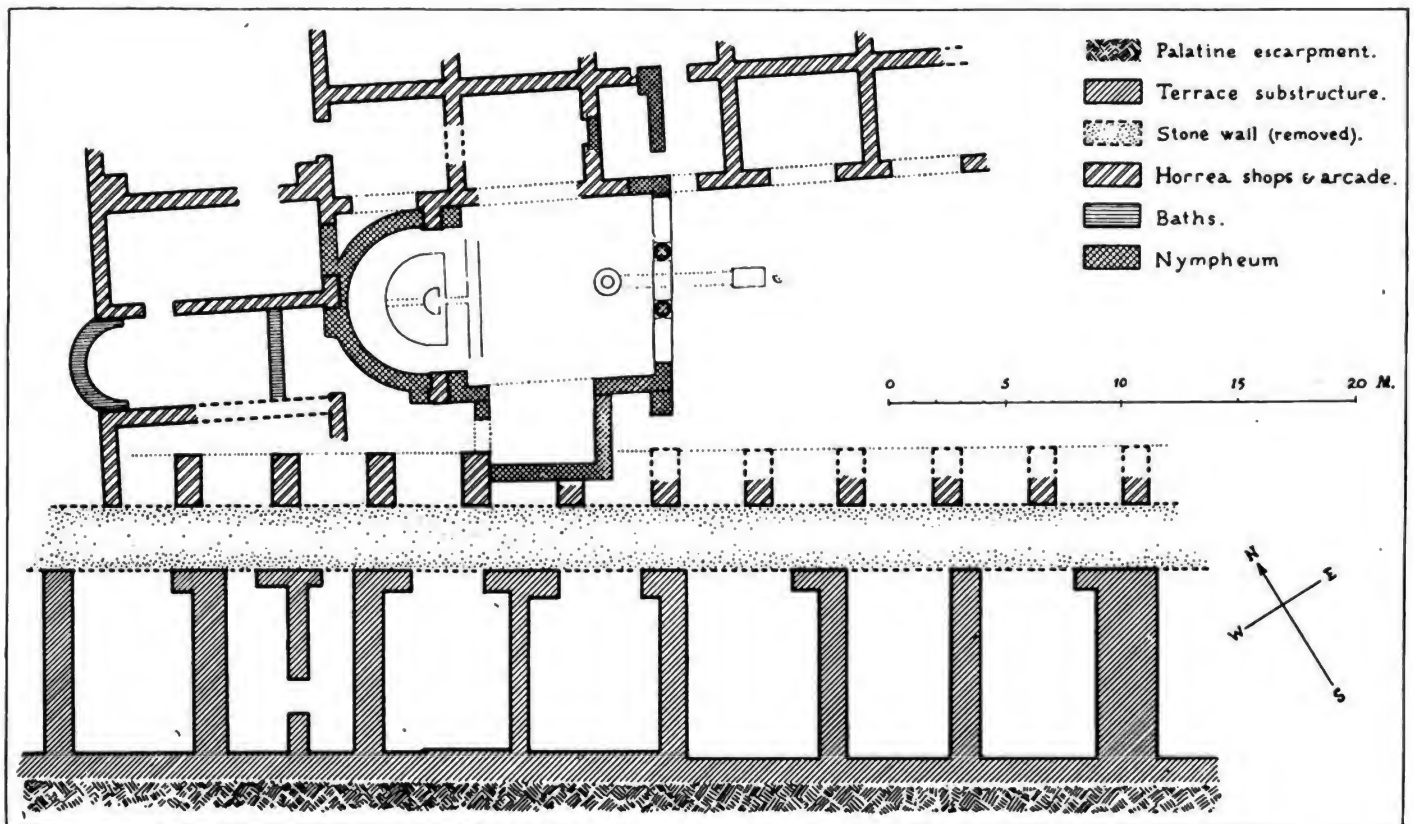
S. Maria de Metrio. General plan (Survey: Frankl).
